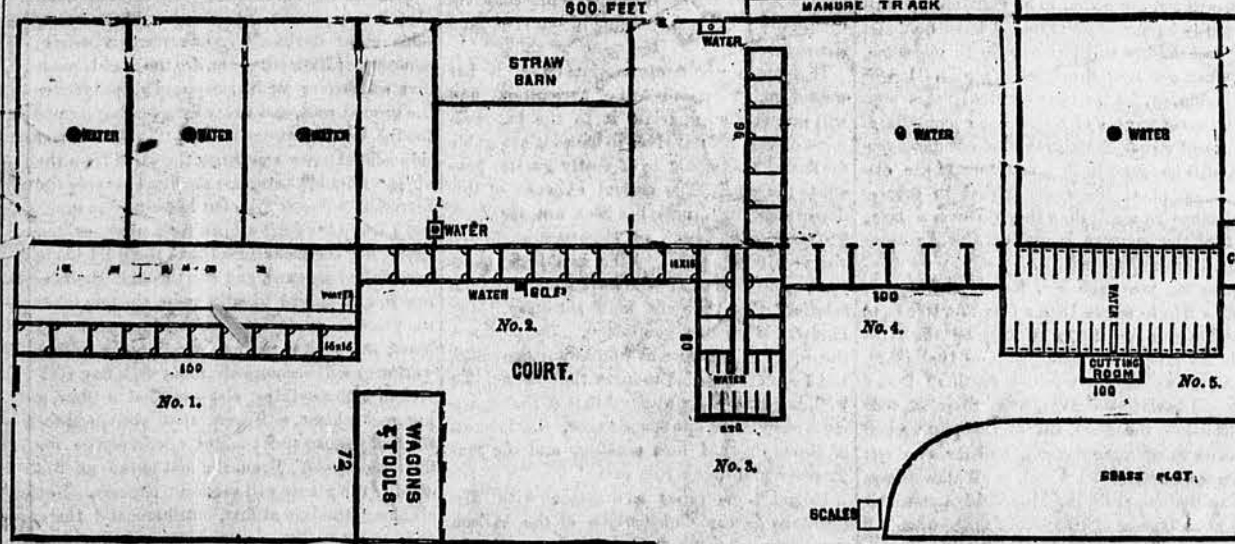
M. W. DUNHAM'S BARN.—GROUND PLAN.
